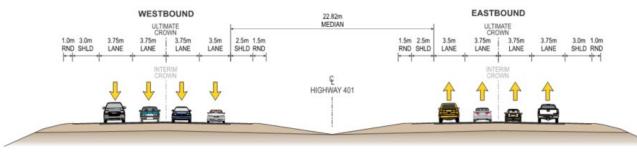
Highway 401 Section 5, Existing and Proposed Cross-Sections
